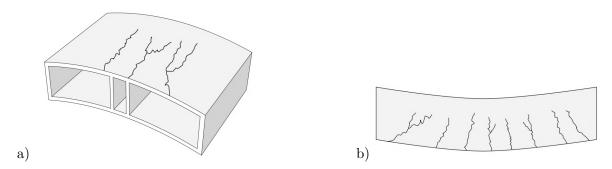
a) Transverse bending b) Longitudinal bending of a tunnel element
